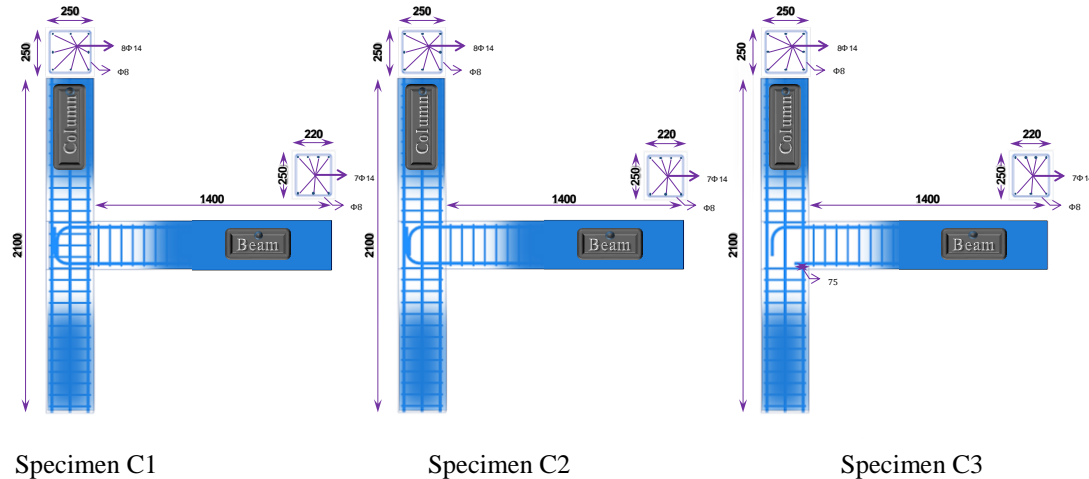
Dimensions and reinforcement details of specimens C1, C2, and C3 (dimensions in millimeters).
